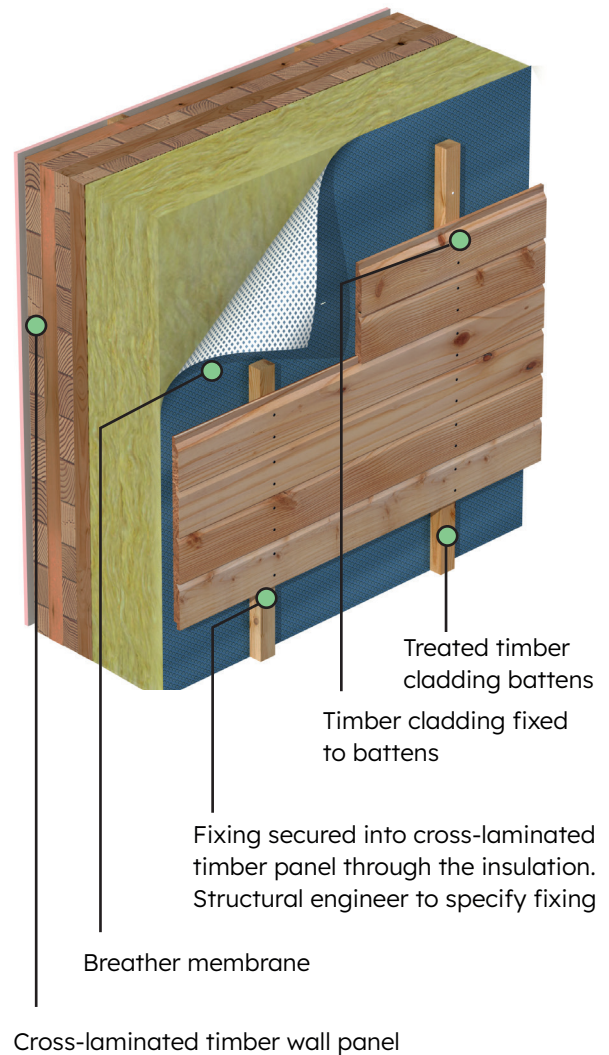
IMAGE: Method A, where cladding is fixed directly to existing walls via cladding battens
